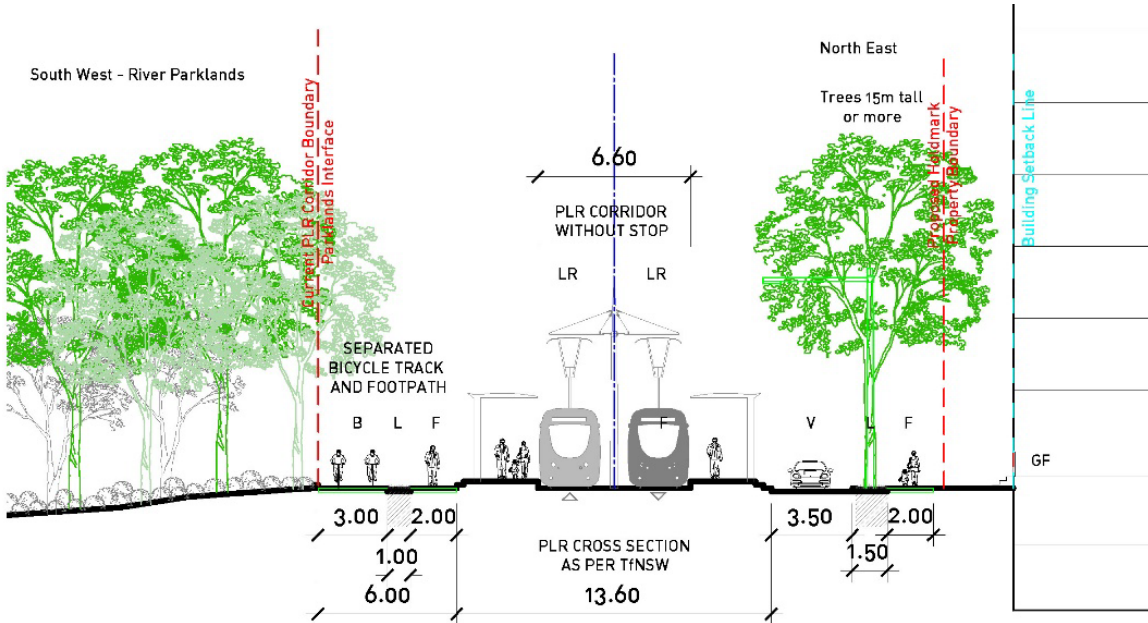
Type 6 Local Street (NSR 6)
